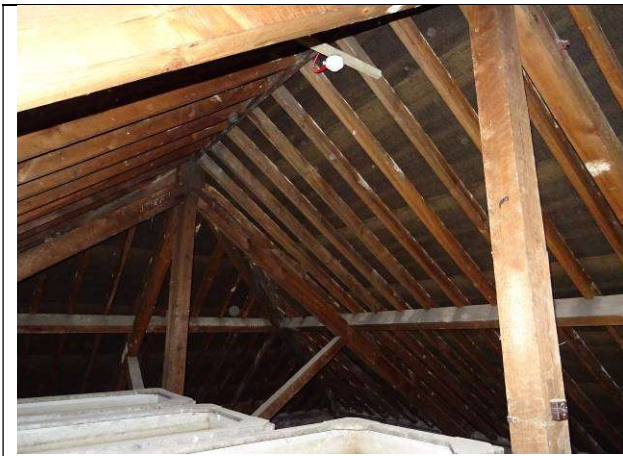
Roofspace, looking east with kingpost trusses, end hip, rafters and purlins
